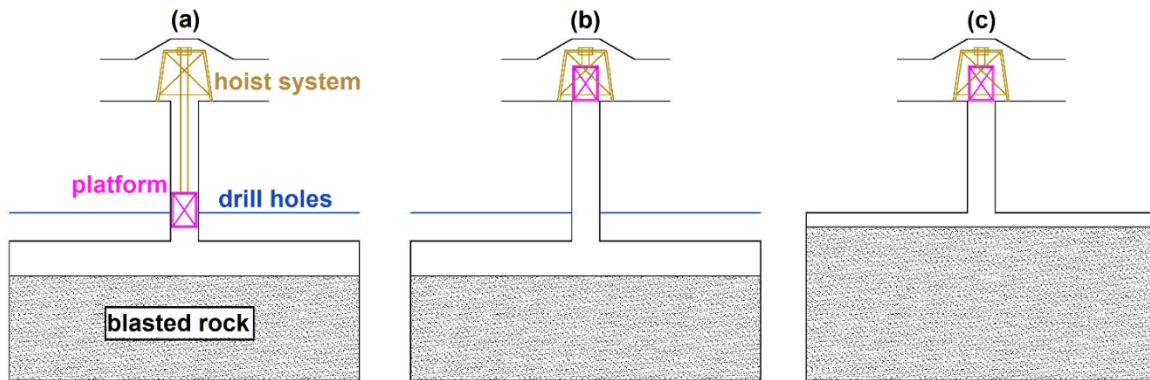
Principle of raise mining in a vertical cross-section; (a) drilling and loading of holes; (b) platform retracted to the top for blasting; (c) advanced excavation after blasting; details of machinery are not shown.
